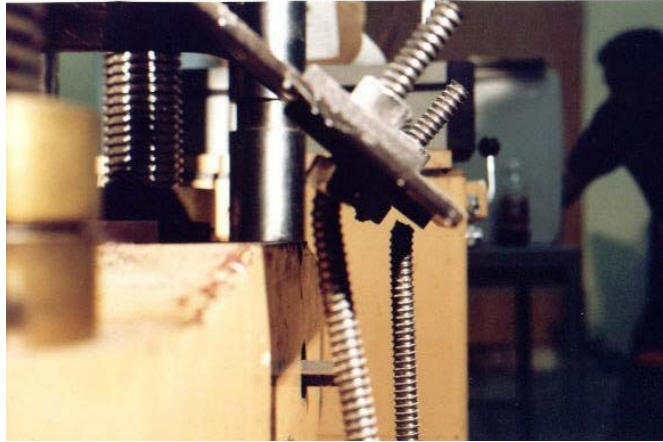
Photograph of fracture of threaded rod in push-pull connection (McMullin *et al.*, 2004)
